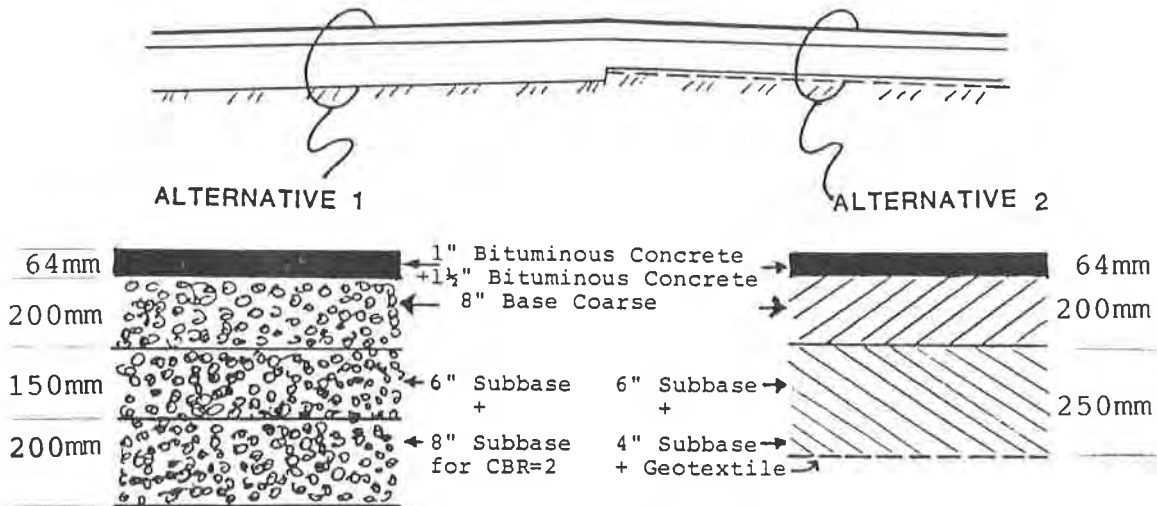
Design Example: Proposed Pavement Design for a Roadway near Washington, D.C. (Christopher and Holtz, 1985)
